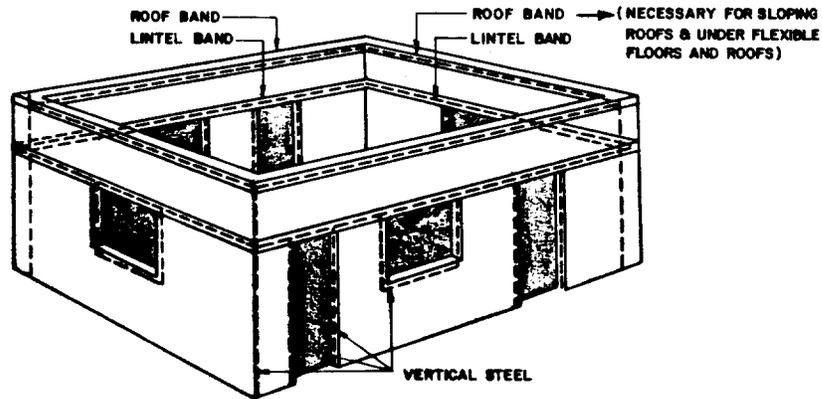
Overall arrangement of reinforcing in masonry buildings
